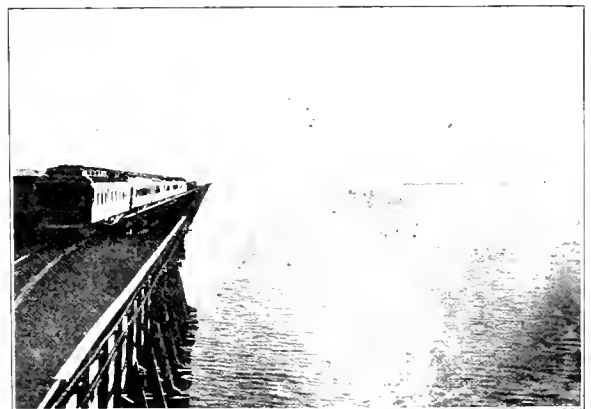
The railroad cut-off across Great Salt Lake. The lake is bridged by a single stretch of track fourteen miles long, built on piles driven into the sand beneath the water.
